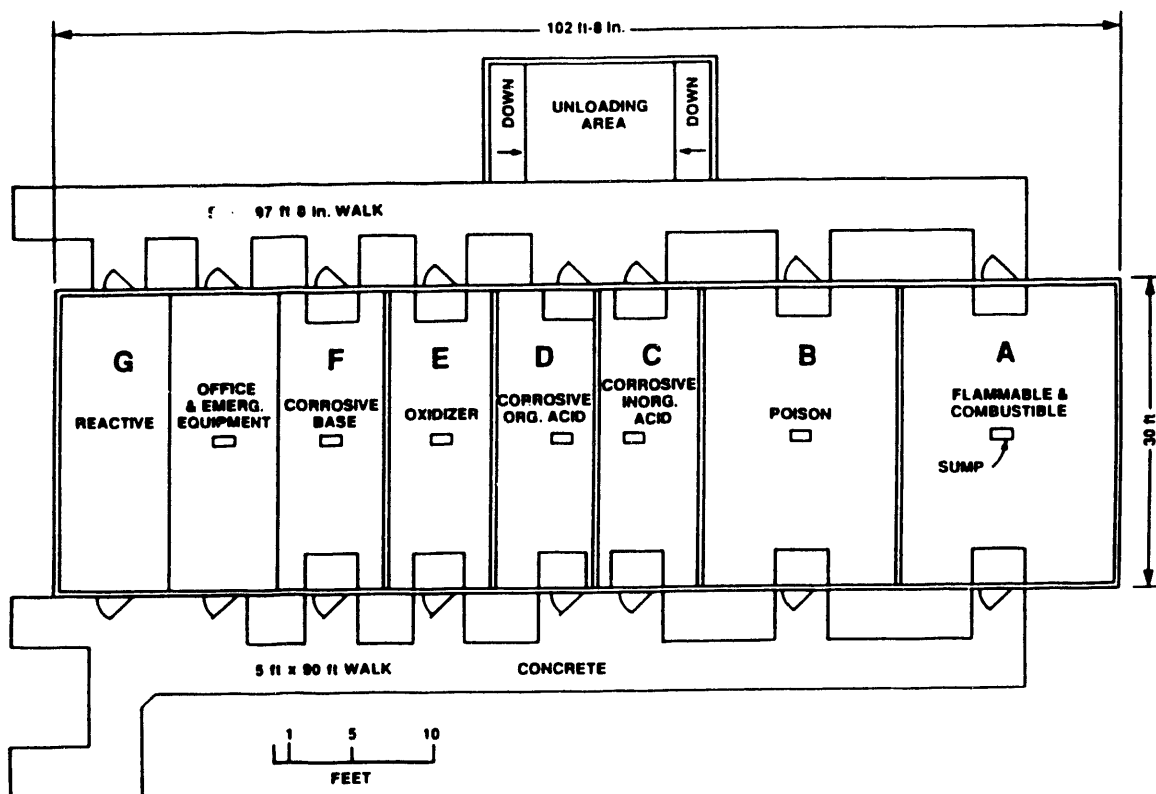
Layout of the Chemical Waste Storage Facility (Building 7653).
